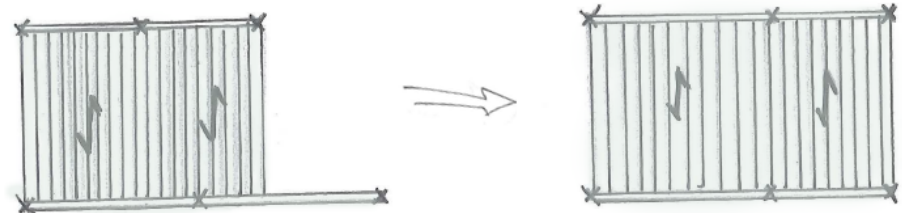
Use same type of beams in subsets connected at the width side of the floorplates.
